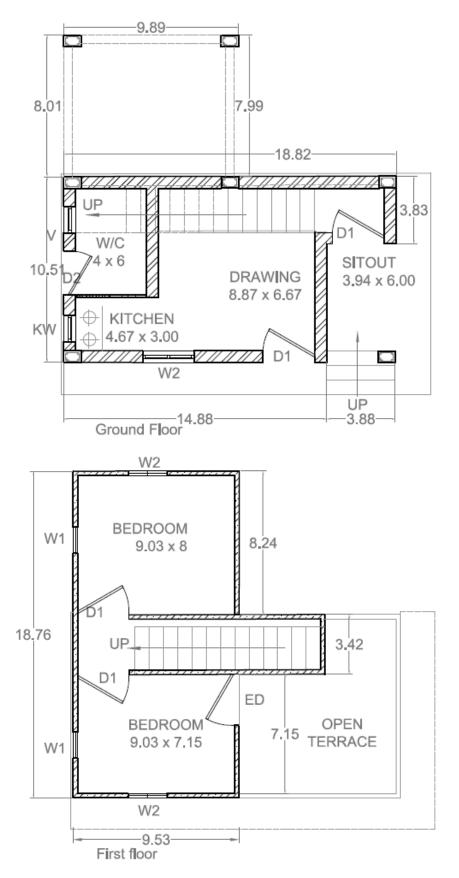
Floor plans of flood resilient unit: Typology 2
